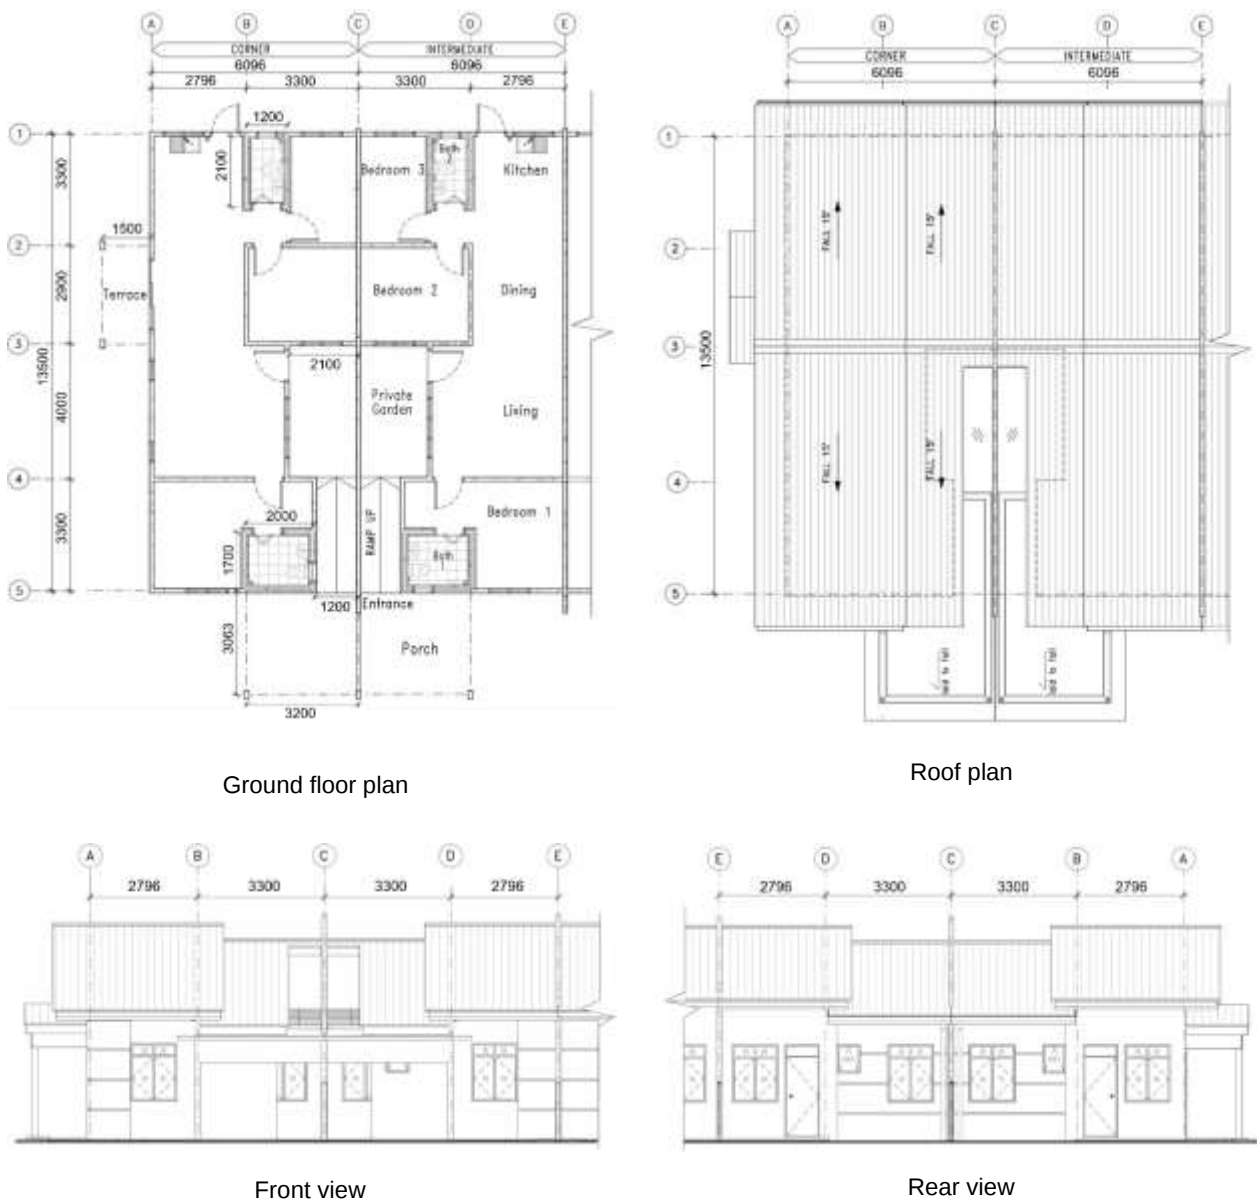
Typical Plan Layout and View for a Single-Storey Terrace House
